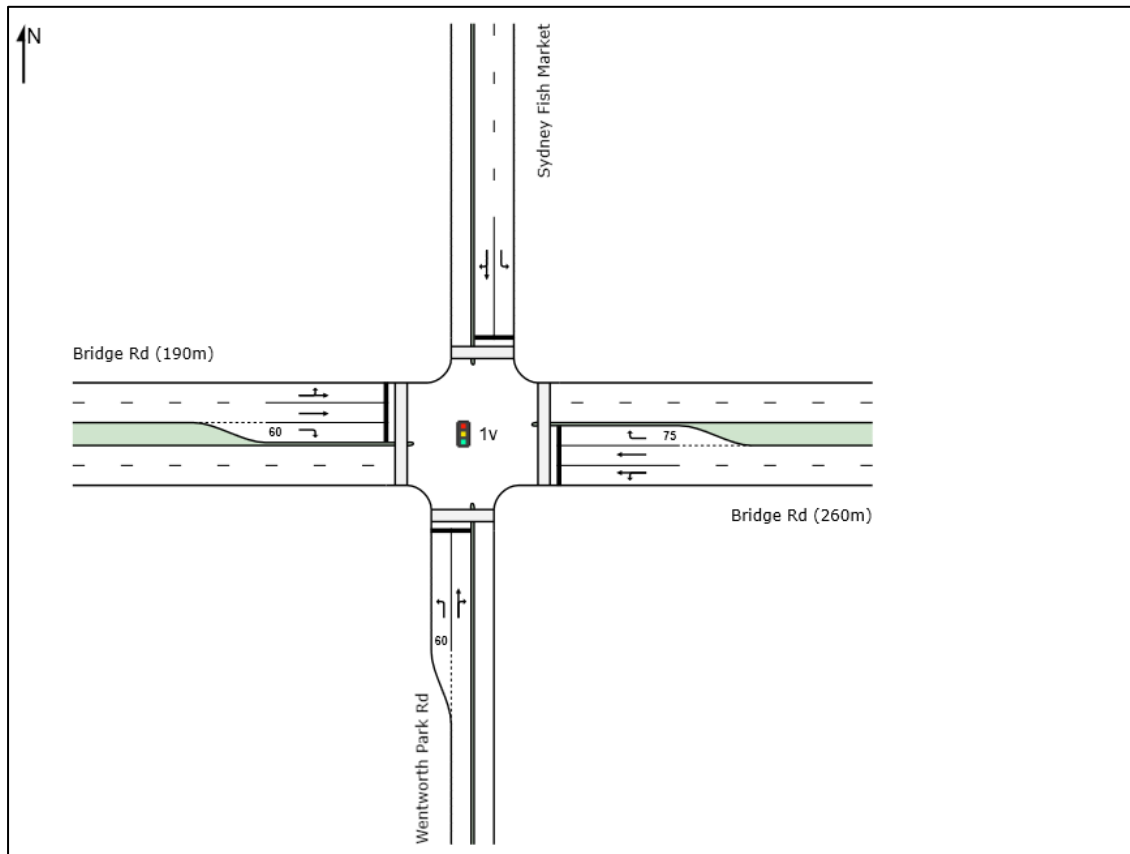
Future year Bridge Road / Wentworth Park Road layout
